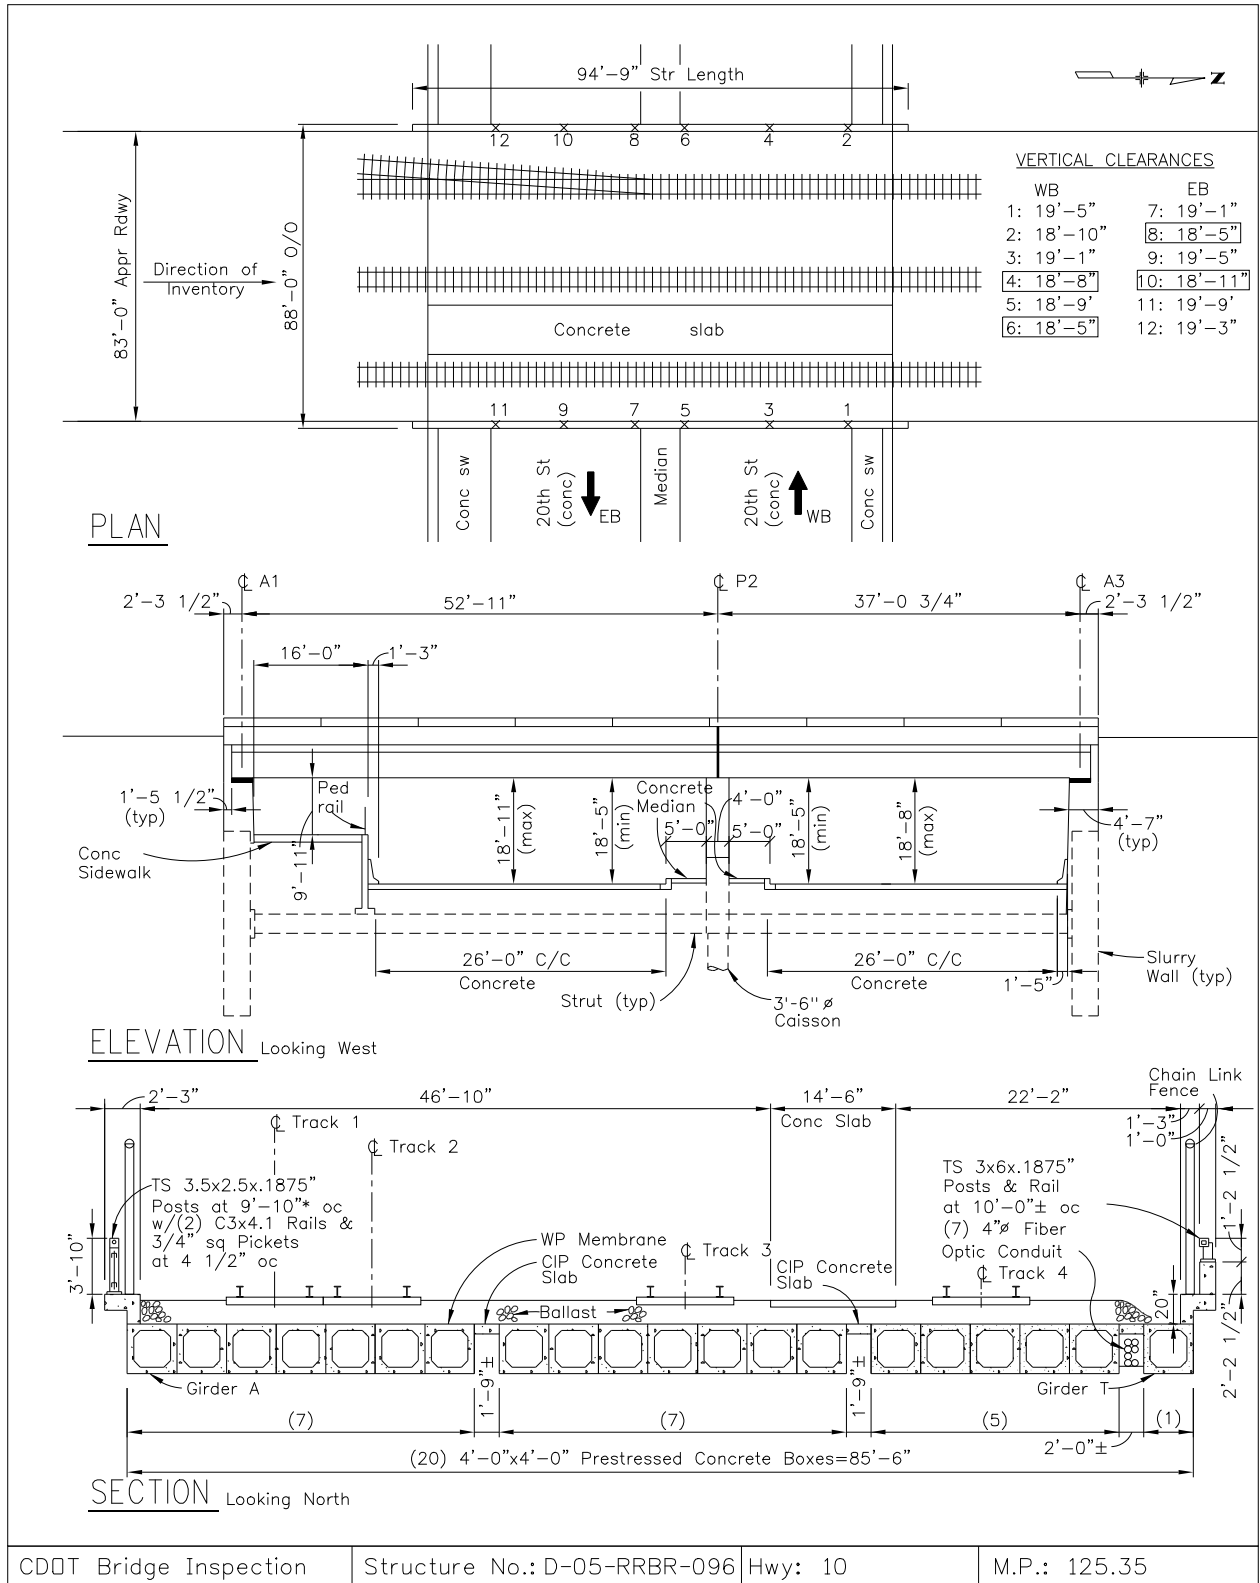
Bridge Inspection Sketch – Example 10
